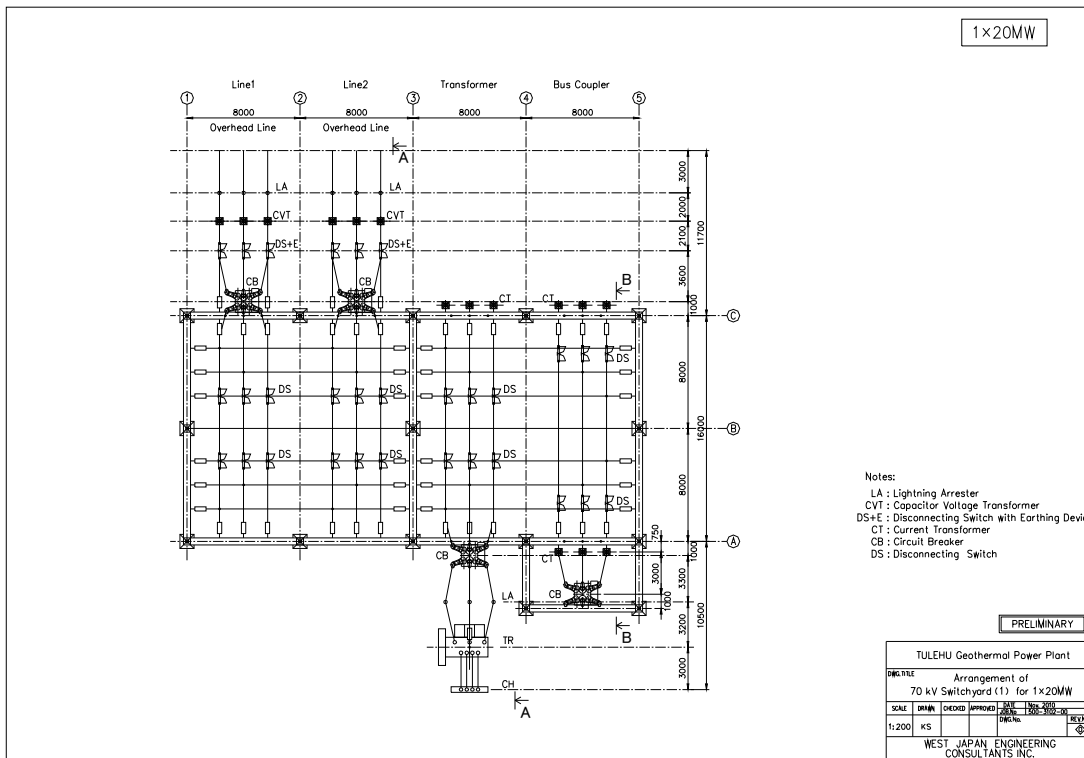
Plan View of 70 kV Switchyard for 1 x 20 MW
